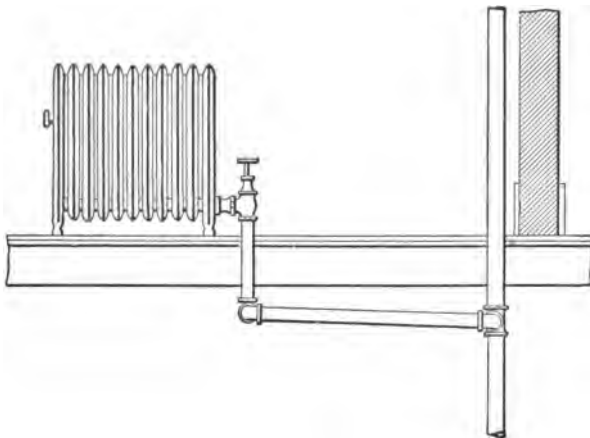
Elevation, One-Pipe Radiator Connection
